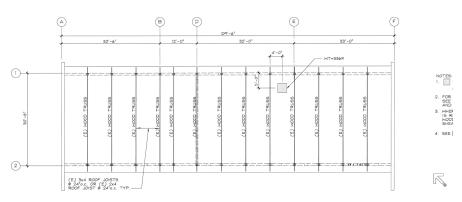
BUILDING 7: 2017 HVAC Upgrade Roof Framing Plan
